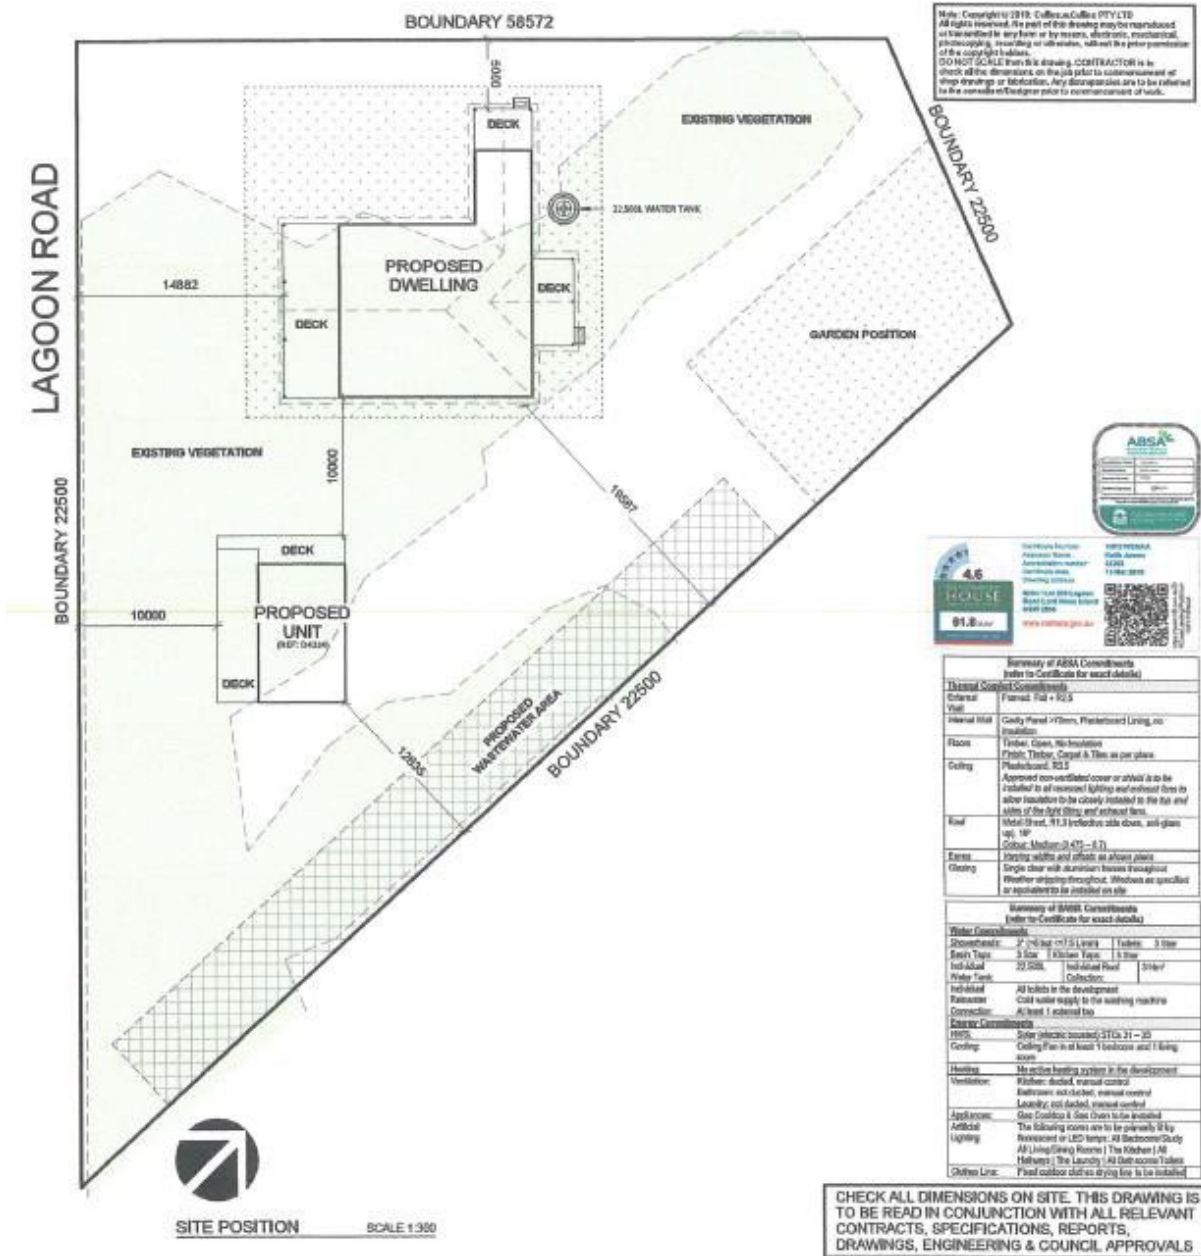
Applicant's submitted site plan proposed Lot "A" showing both the proposed Dwelling and Tourist Accommodation
